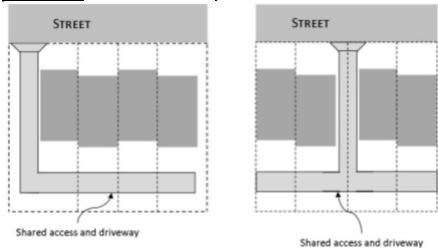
F.2.b Townhouse Rowhouse Development with Corner Lot Access
